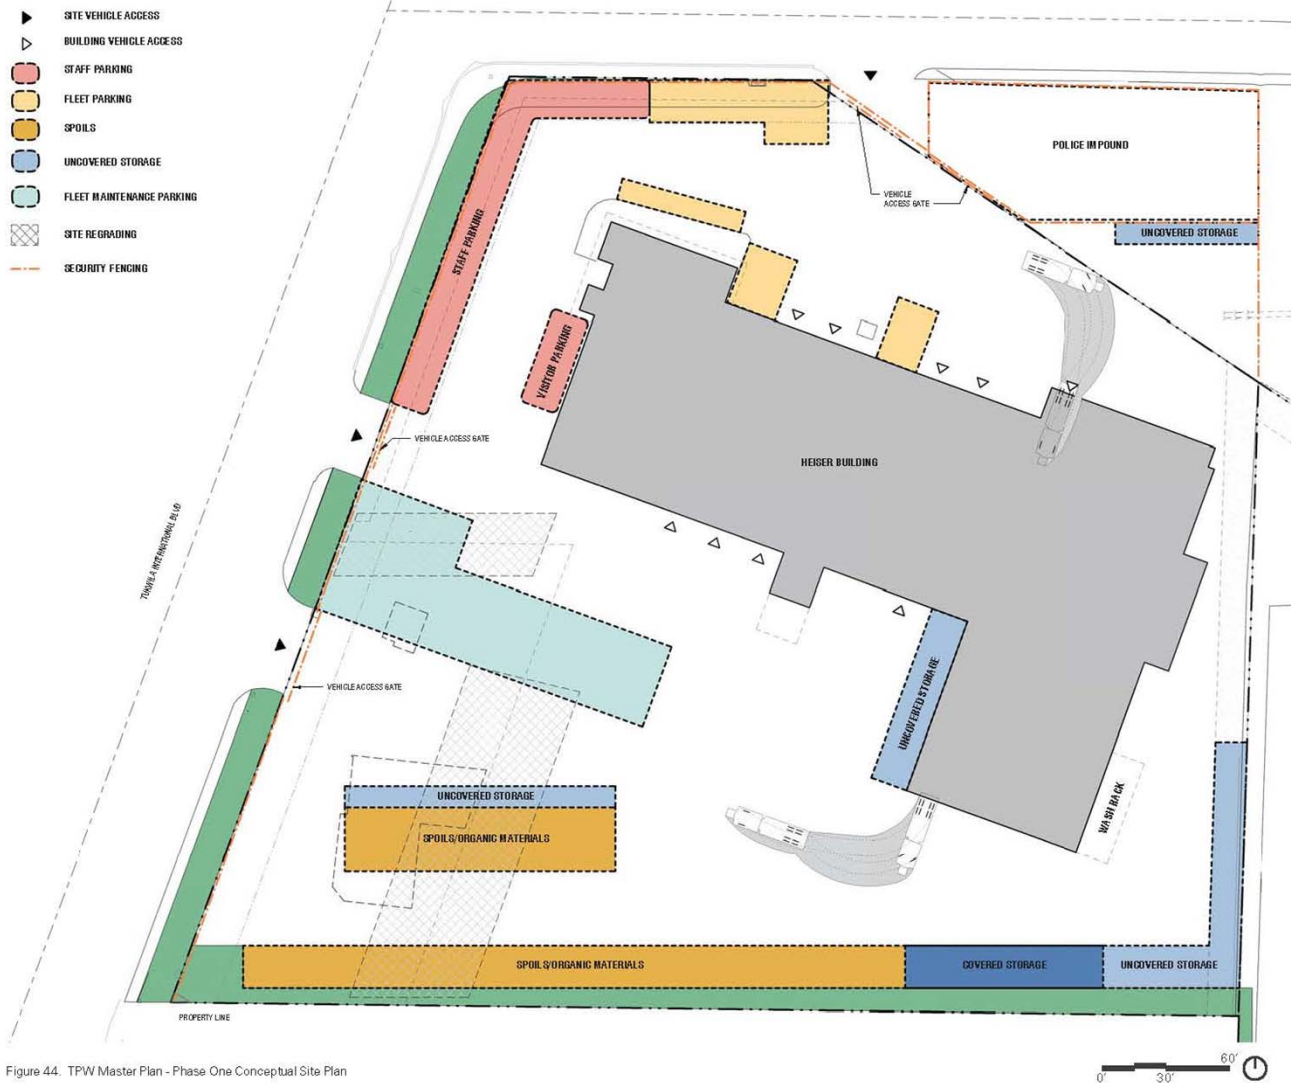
TPW Master Plan - Phase One Conceptual Site Plan
